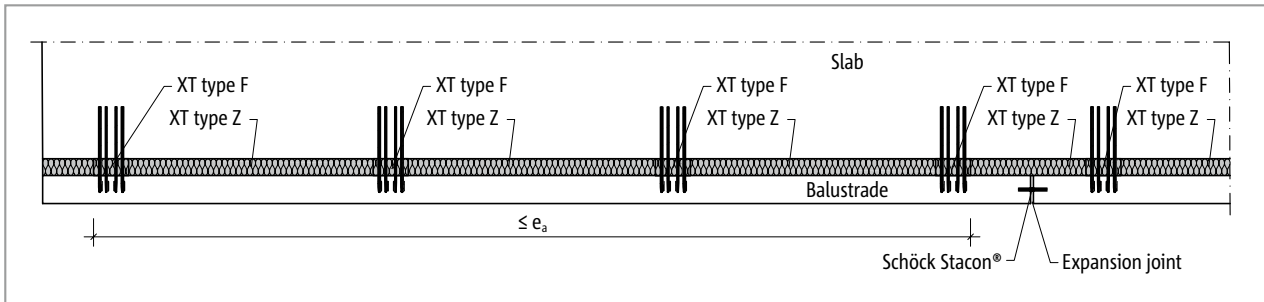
Schöck Isokorb® XT type F: Expansion joint arrangement
